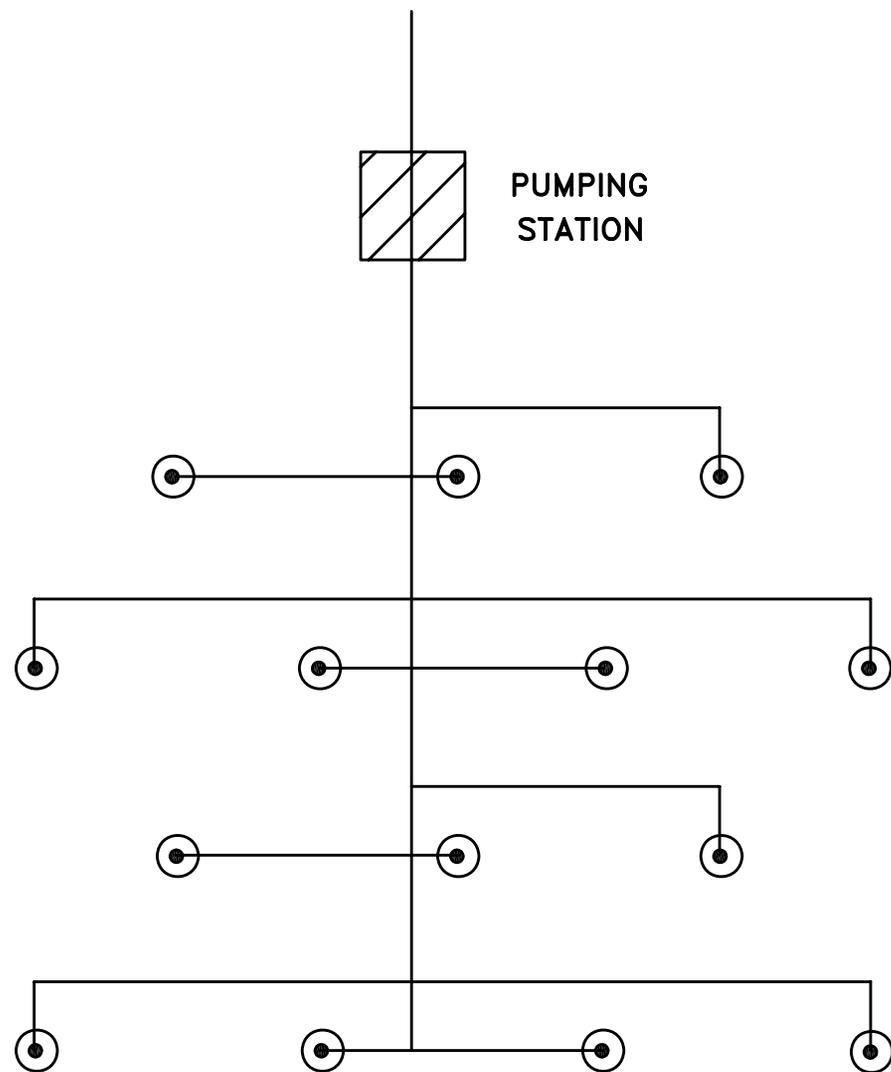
PLAN VIEW OF CONCEPTUAL RECLAIMED WATER ASR SYSTEM FOR PELICAN BAY/COLLIER COUNTY NORTH
